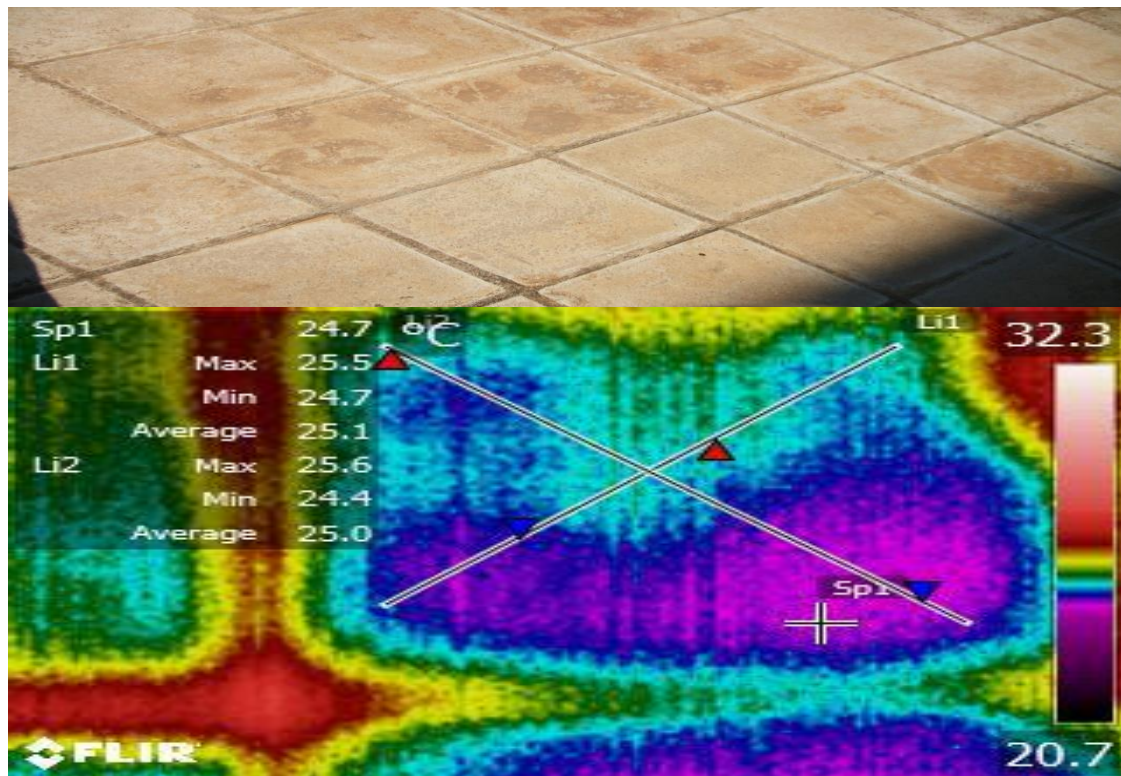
Thermal and visual photo of 2nd floor's roof tiles
